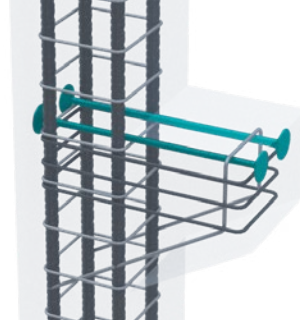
CONCRETE CORBEL REINFORCED BY USING PSB® HEADED ANCHORS
